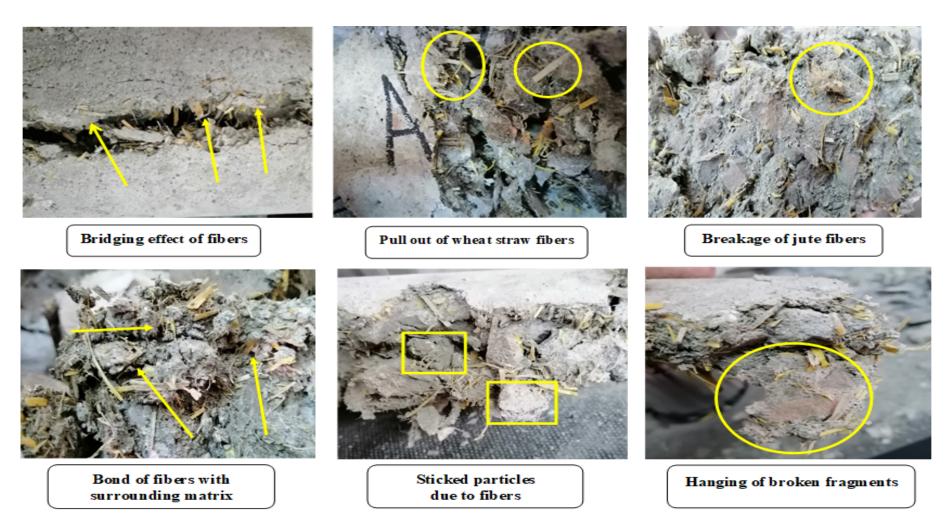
Fractured Surfaces of JWS-FRC Tested Specimens
